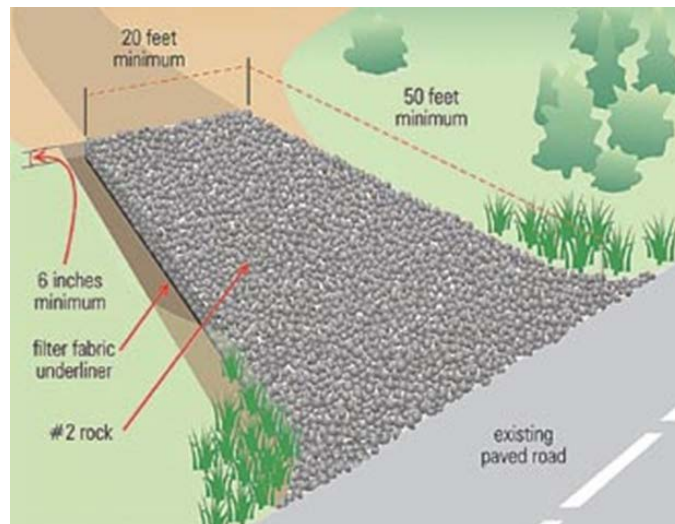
Stabilized Construction Entrance/Exit Pad (Scott et al. 2004).
